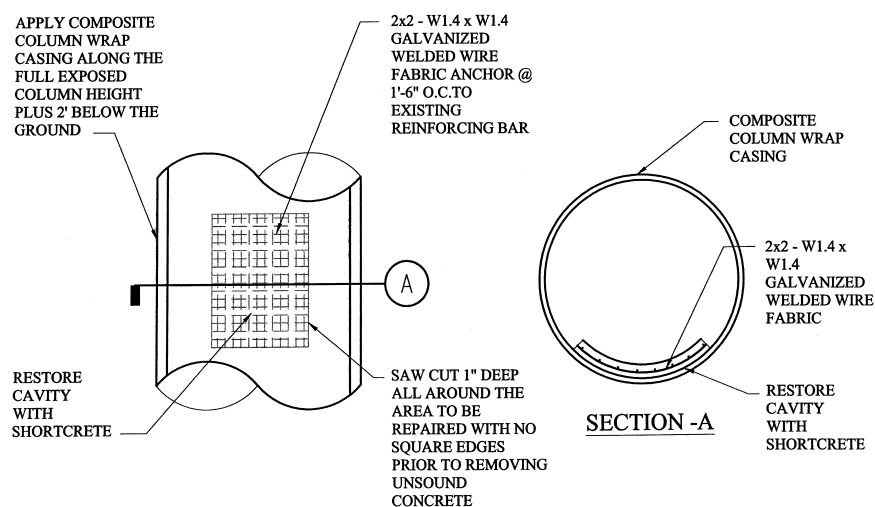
Repair and Strengthening of Concrete Bridge Columns by CFRP Casing
